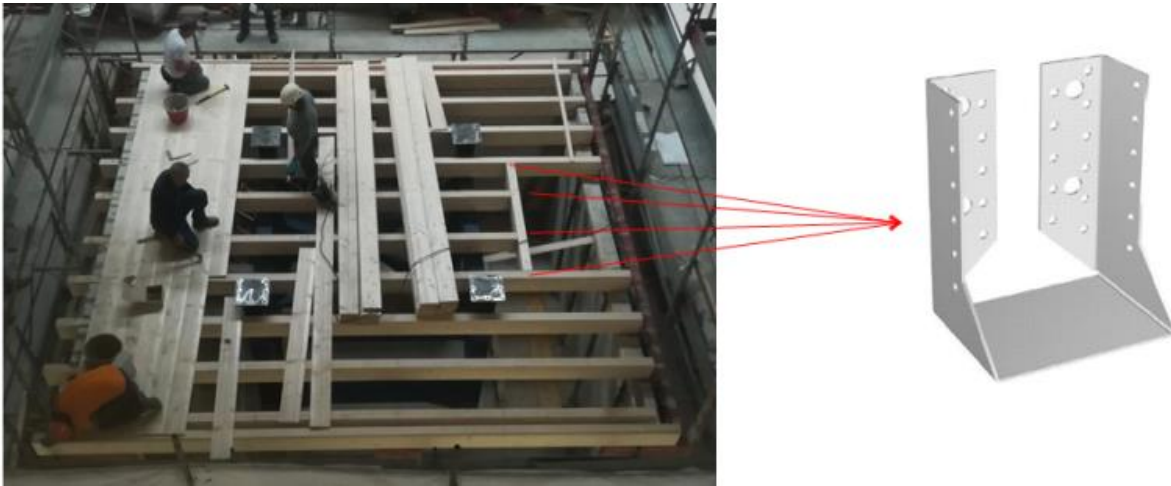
Timber floor framing: timber-to-timber connection at staircase hole.
